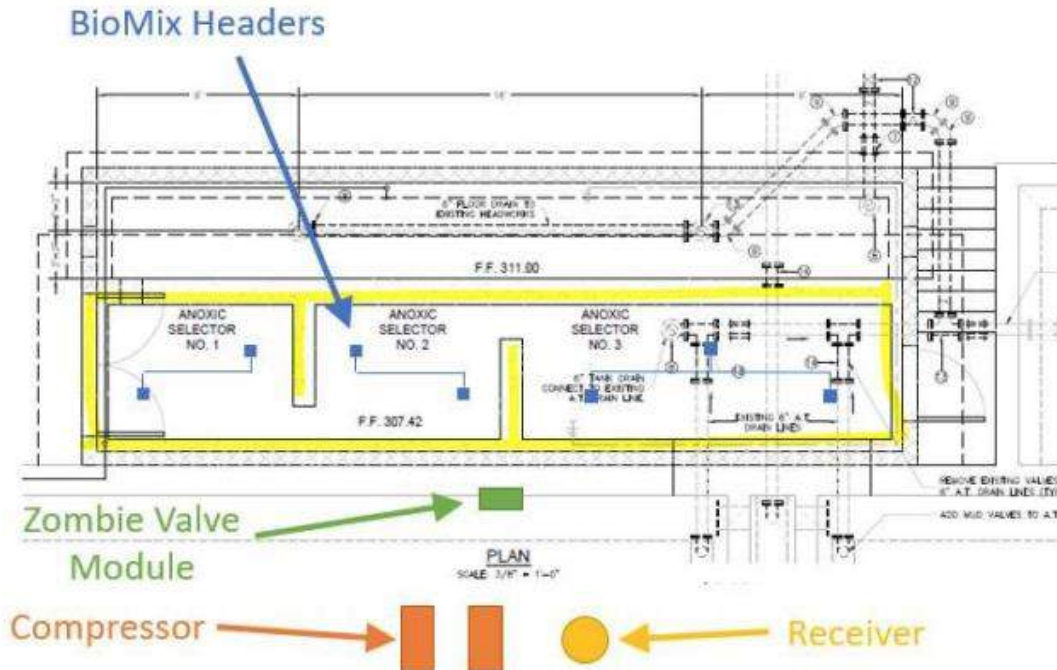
Anoxic Selectors Alternative #2 - Compressed Gas Mixing System Layout
